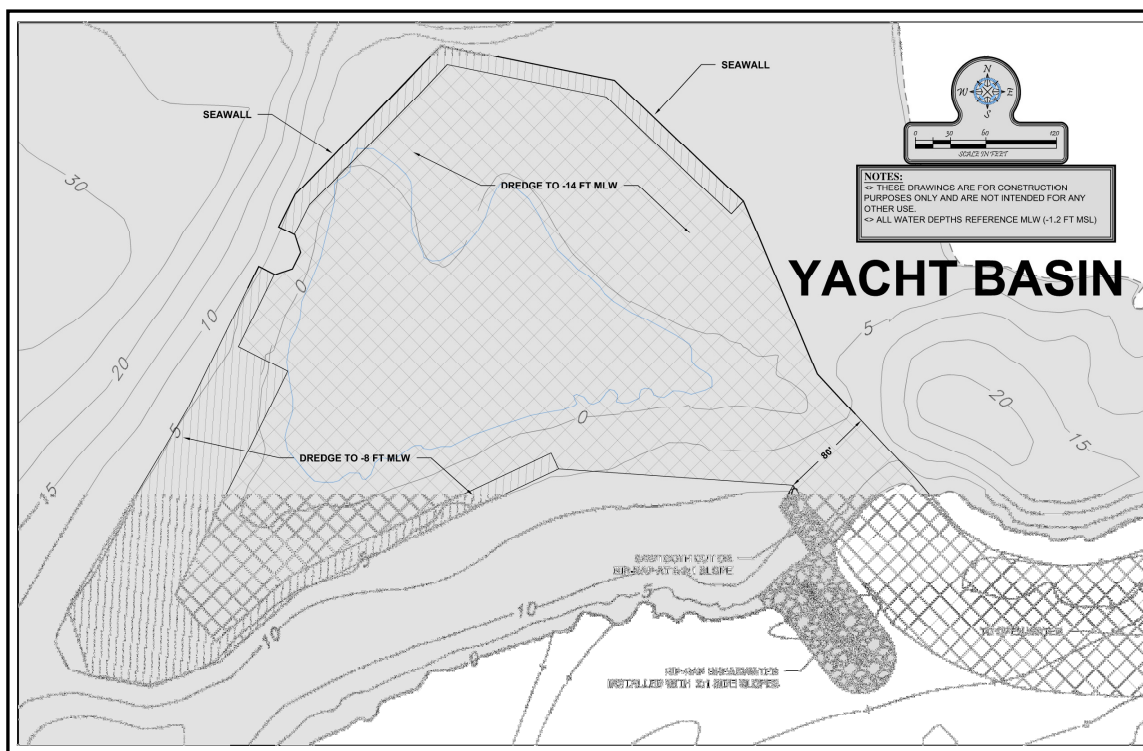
Yacht Basin Dredge, Seawall, and Breakwater Plan (Exhibit 5)
